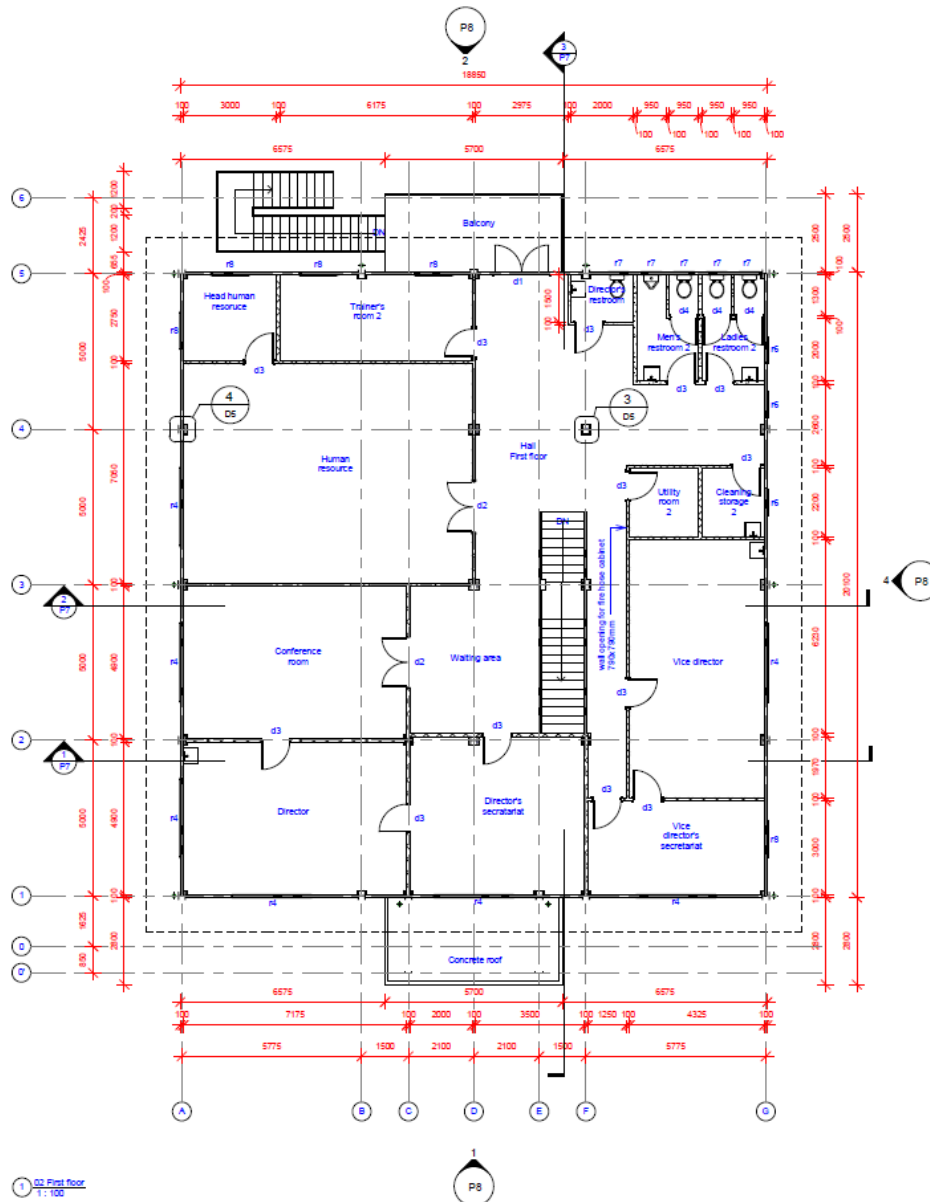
Architectural Layout First Floor (SINTEC NV, 2018).
